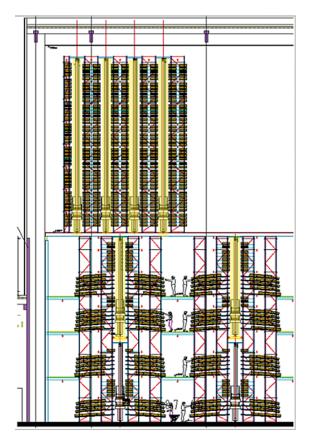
Example of S/R machines at the 2nd level, supported by the rack
